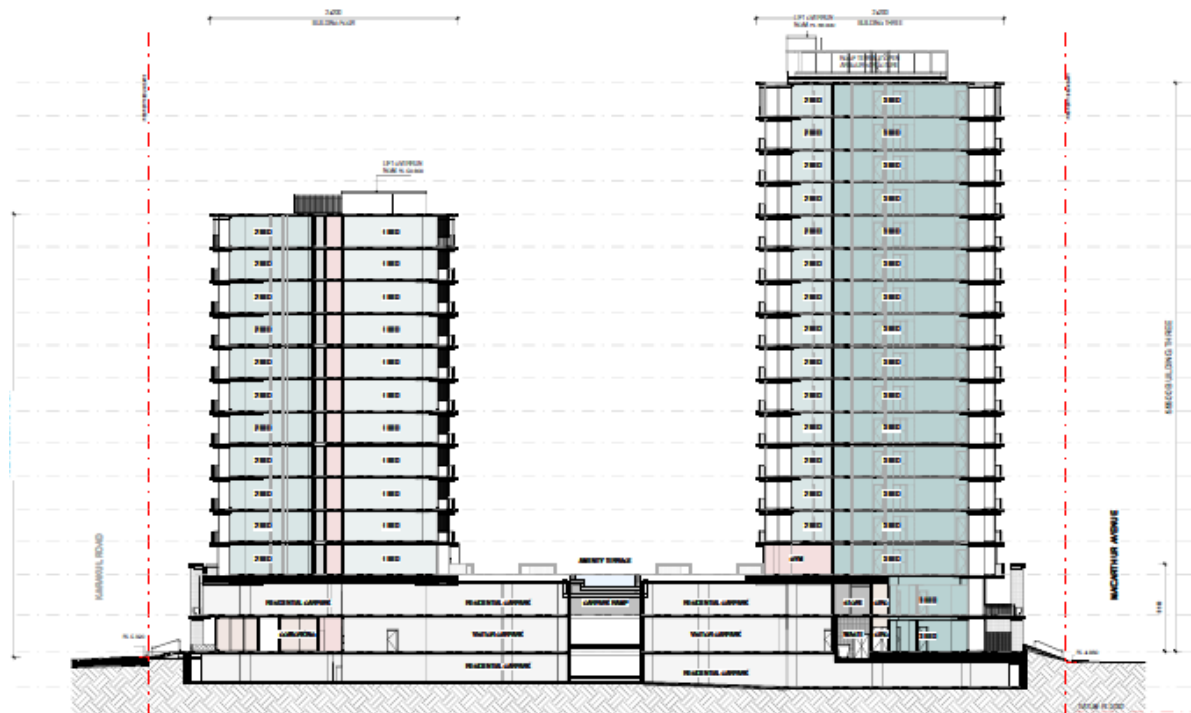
Extract from proposed development Section plan For Site 18B(Carr 24047-TP3-3001).
